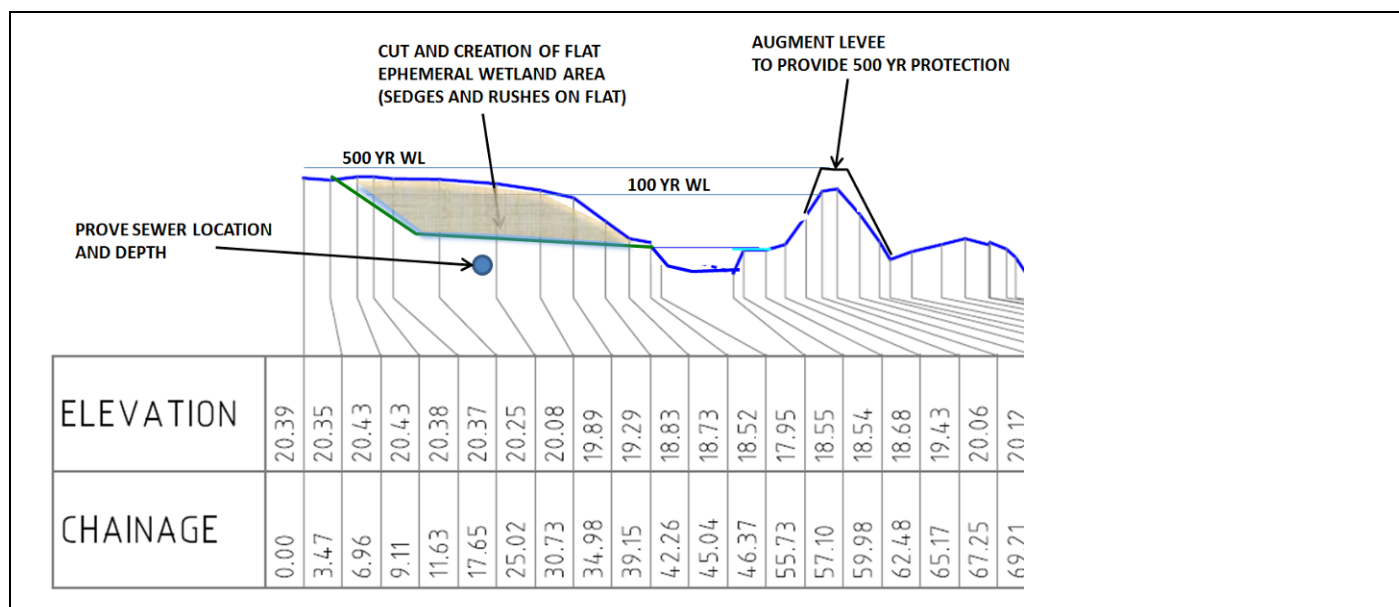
Proposed HVCD Flood Mitigation Works – Typical Cross Section 2011 Report 5
